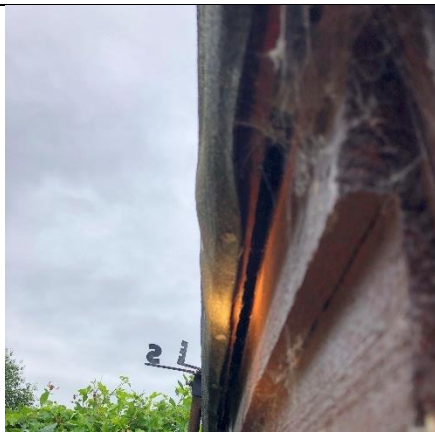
General character of outbuilding associated with 344 Poplars Avenue
